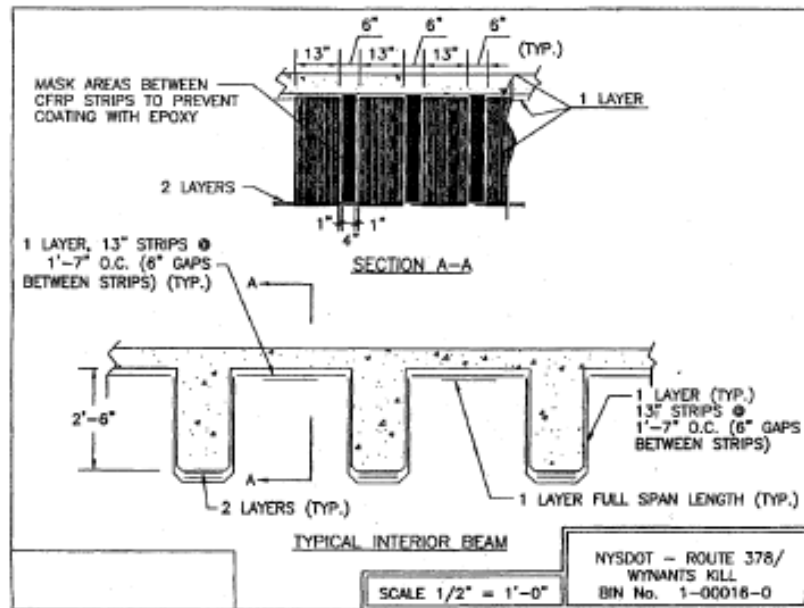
Proposed plan for FRP laminate installation (Hag-Elsafi et al. 2001).
